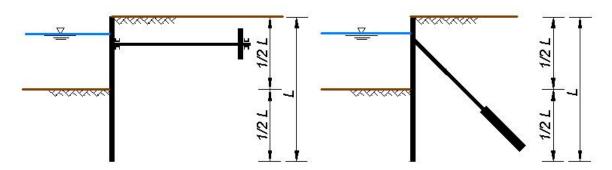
Sheet piling with anchored wall and with grout anchor
